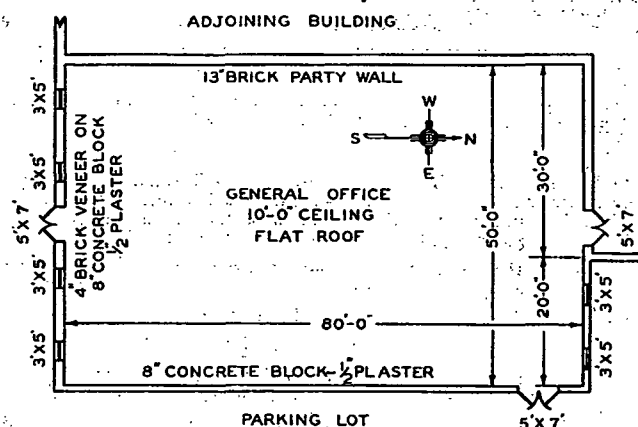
PLAN OF ONE-STORY OFFICE BUILDING
